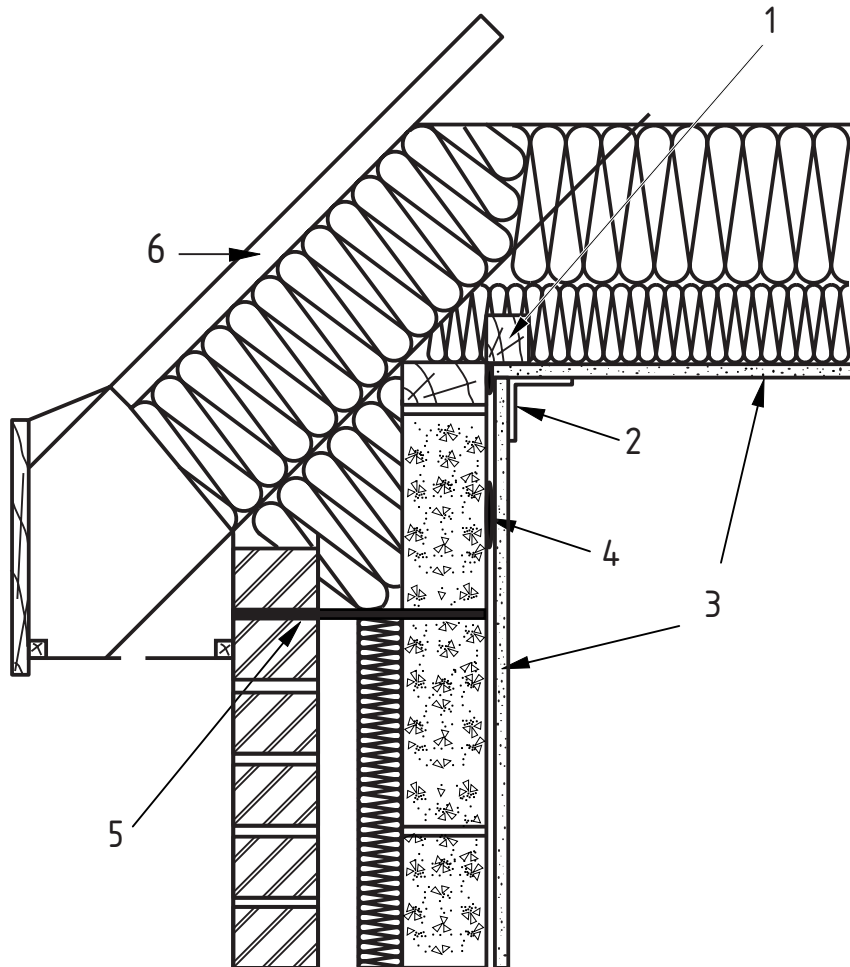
Ensuring an air-tight seal at the junction of a masonry cavity wall and ceiling using air-impermeable foil or lining paper
